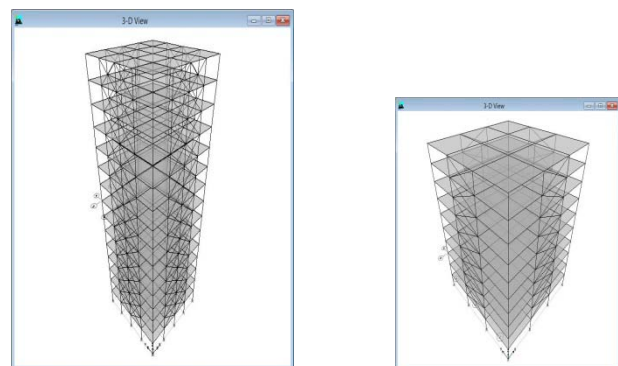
3D view of 15 Storey and 10 storey structure with bracing system.
